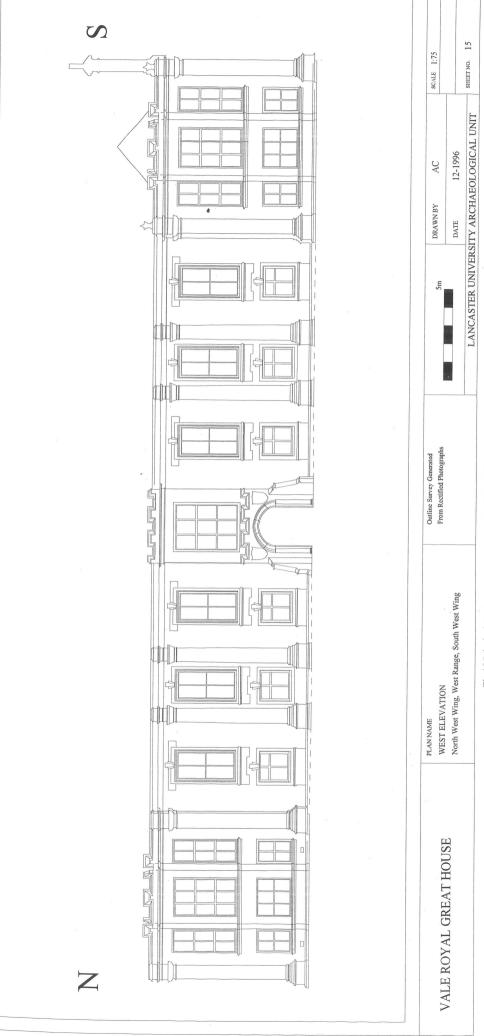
Principal Western elevation - North West Wing, West Range, and South West Wing
